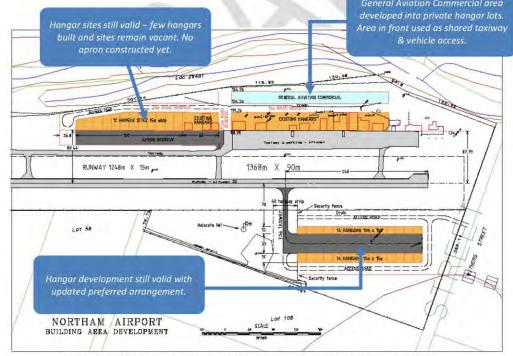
Building Area Development Plan from Northam Master Plan - June 2006
